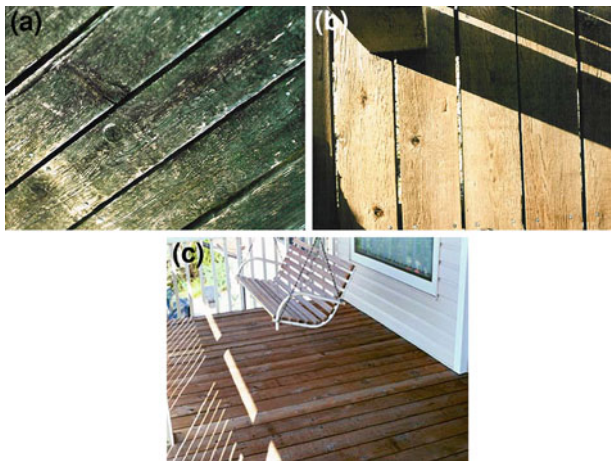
a Floor boards, weathered—mold; b floor boards, clean, dried before staining; c boards, before staining
